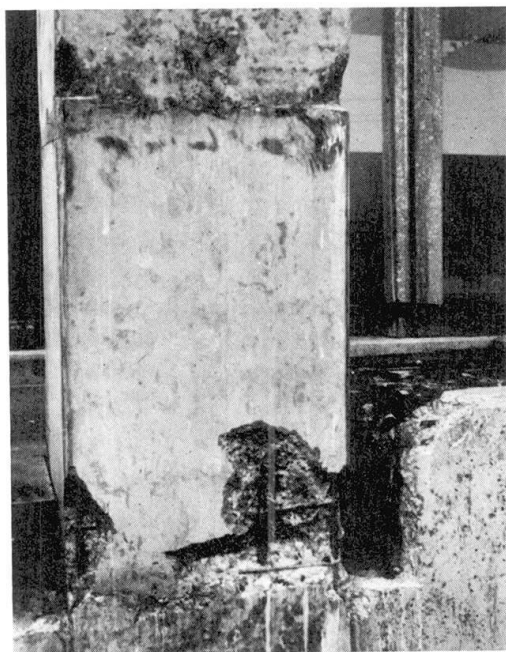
(after September 15th): Foot of a column in the Fantoni furniture factory in Rivoli di Osoppo. By repairing the cracked column foot it was hoped to restore the original carrying capacity. The renewed earthquake load caused the same damage as the first shock, the repaired fixing points of the columns were again cracked and the concrete crumbled in the most highly stressed areas.
